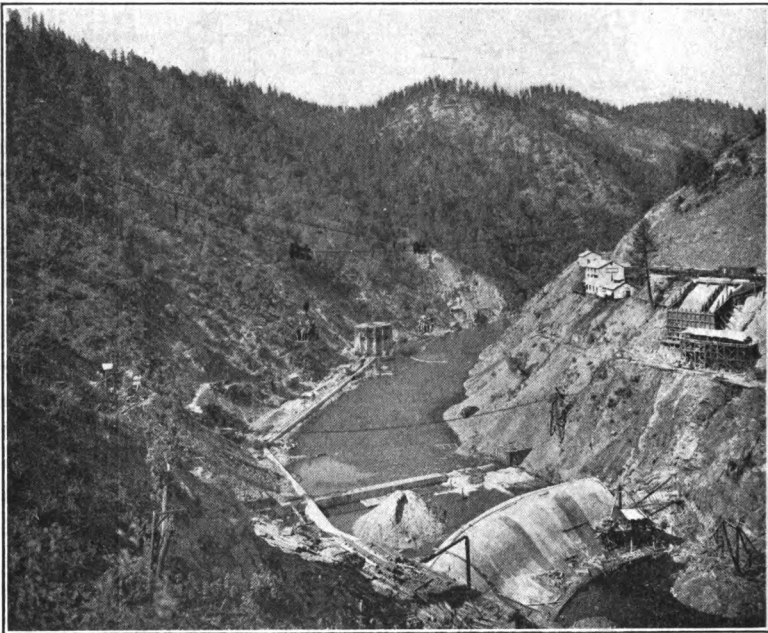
VIEW OF MASONRY DAM AND INTAKE TOWER.
